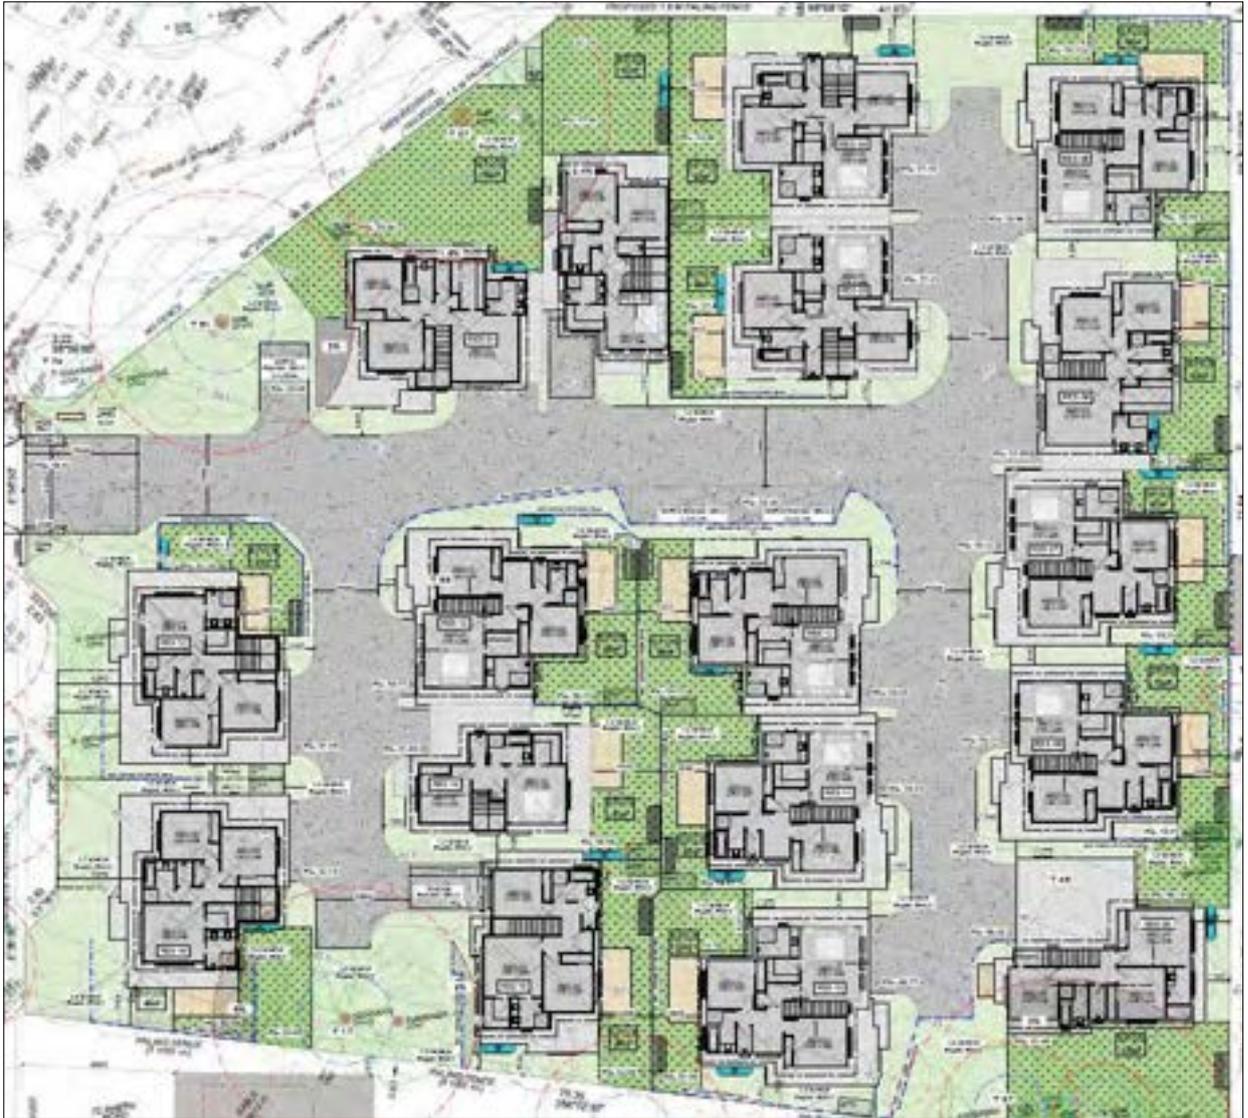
Proposed upper floor plan identifies extensive double-storey built form throughout the site.
